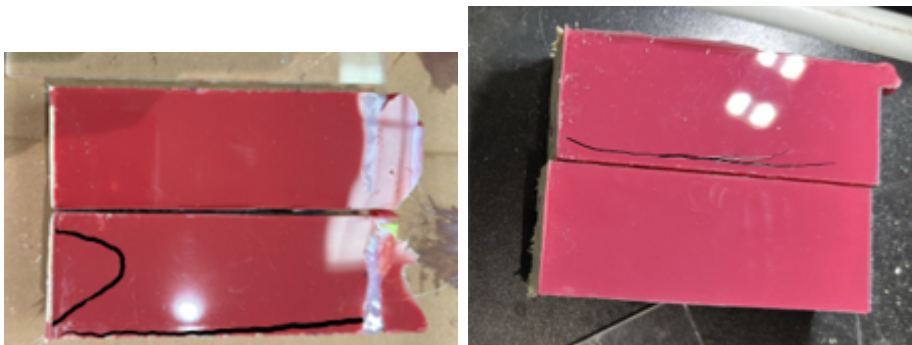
Left: Picture taken of the filling of adhesive, done with one hole drilled at 45° angle. Right: Picture taken of the filling of the adhesive, done with two holes on each side of embedment length. Both were glued laying horizontal on a flat surface. Black lines are drawn in to show the unevenness.
